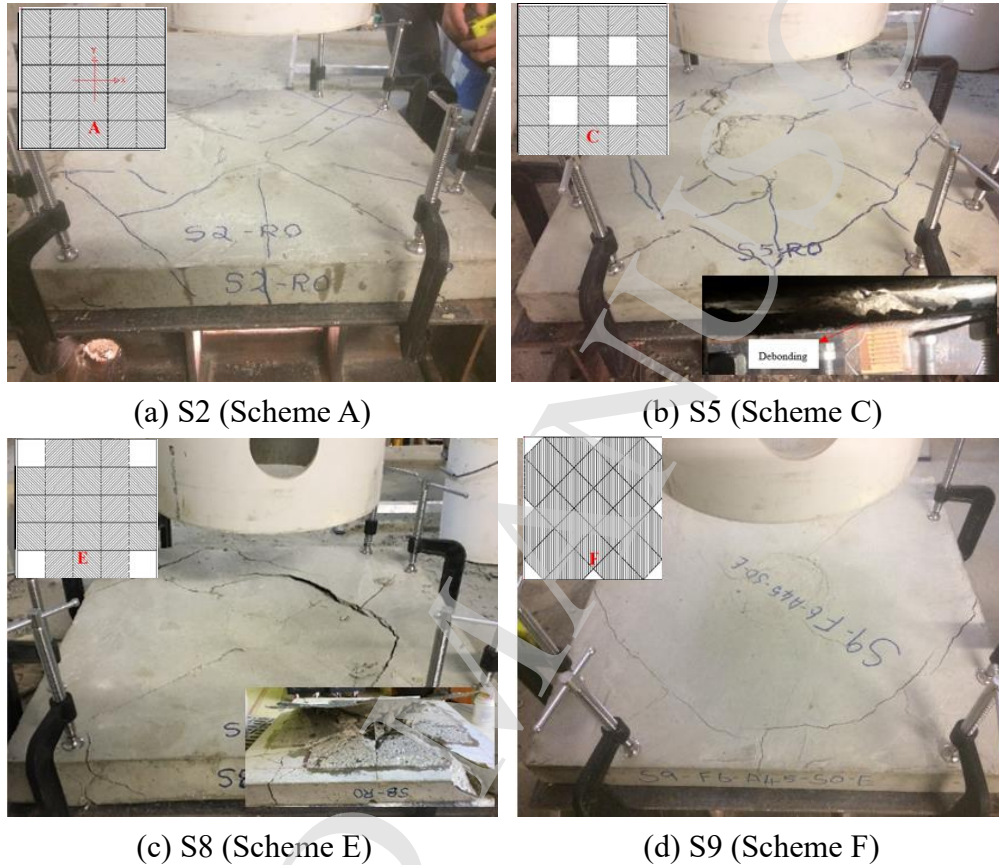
Failure modes of RC slabs with different BFRP layouts (1.5 m drop height)
